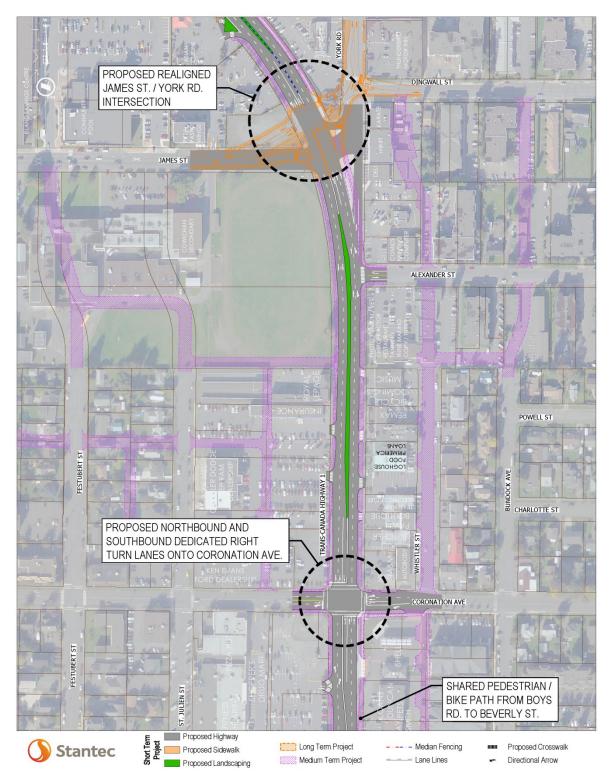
TCH Project Sequence–Trunk Road to James Street/York Road
